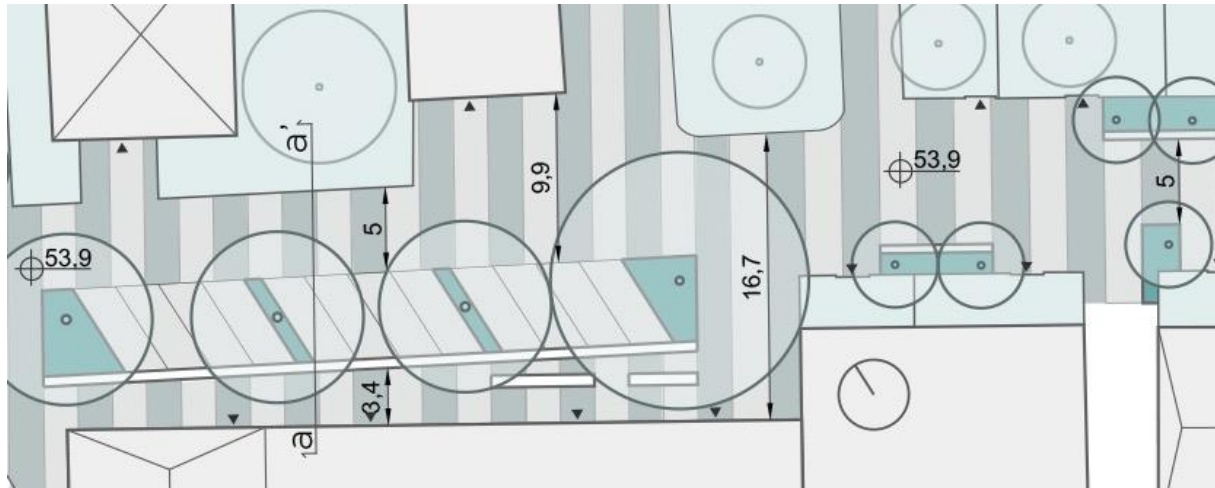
(b). Stretch 1, option 2: total sharing; plan and section (a-a') show a more hospitable and varied street landscape.
